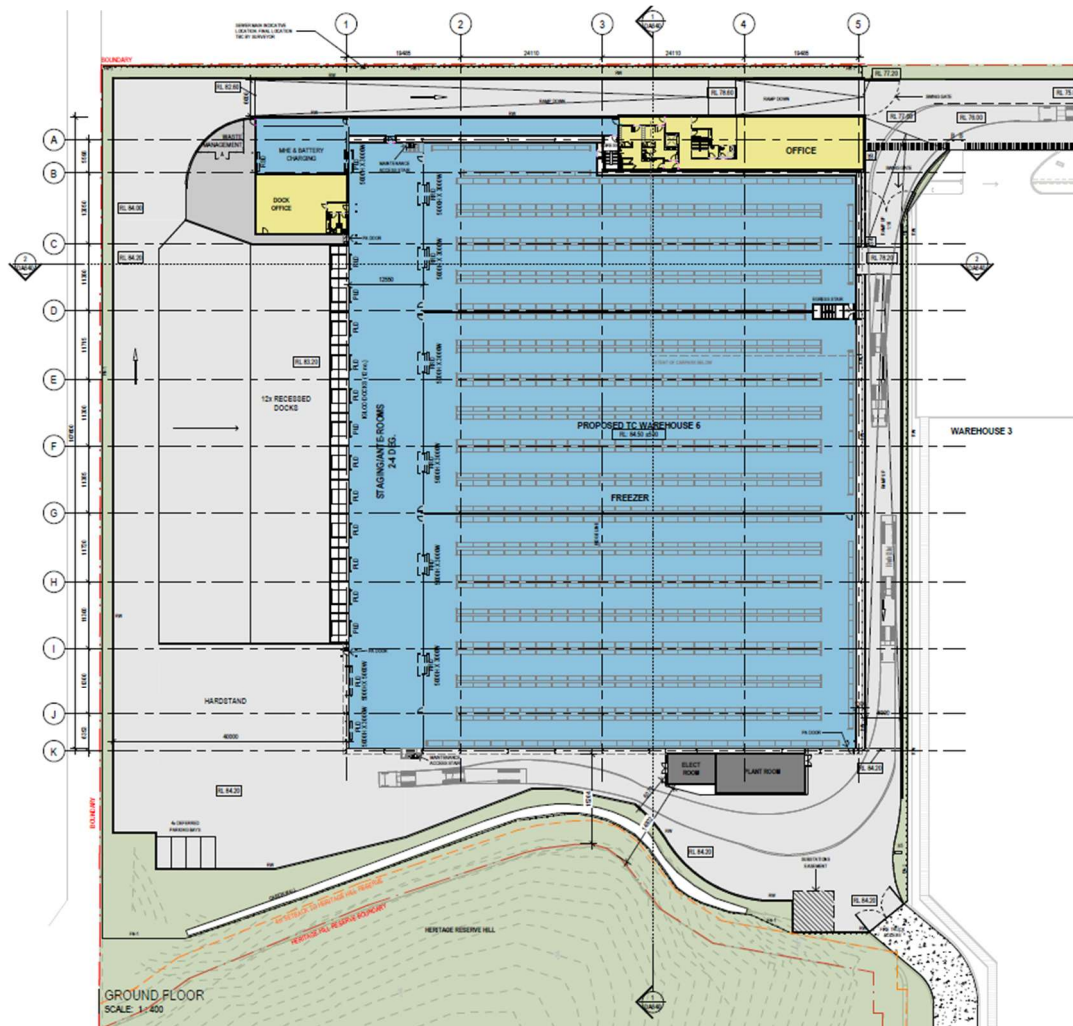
Proposed Warehouse 6 layout (Source: Watson Young)
